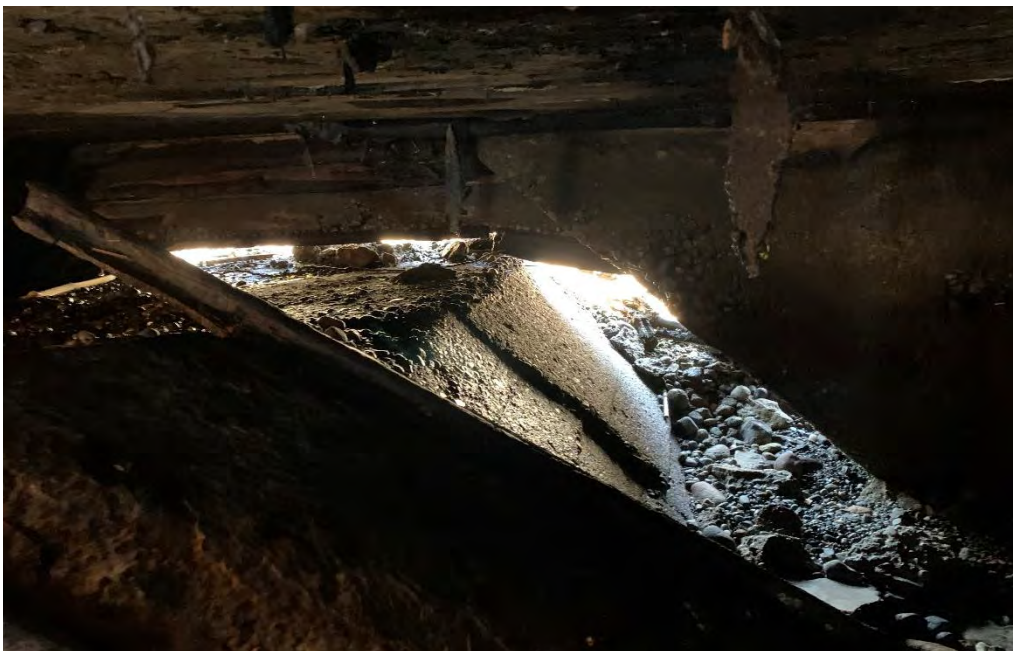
Pipe E plugged with CDF ~7 feet east of bulkhead.
